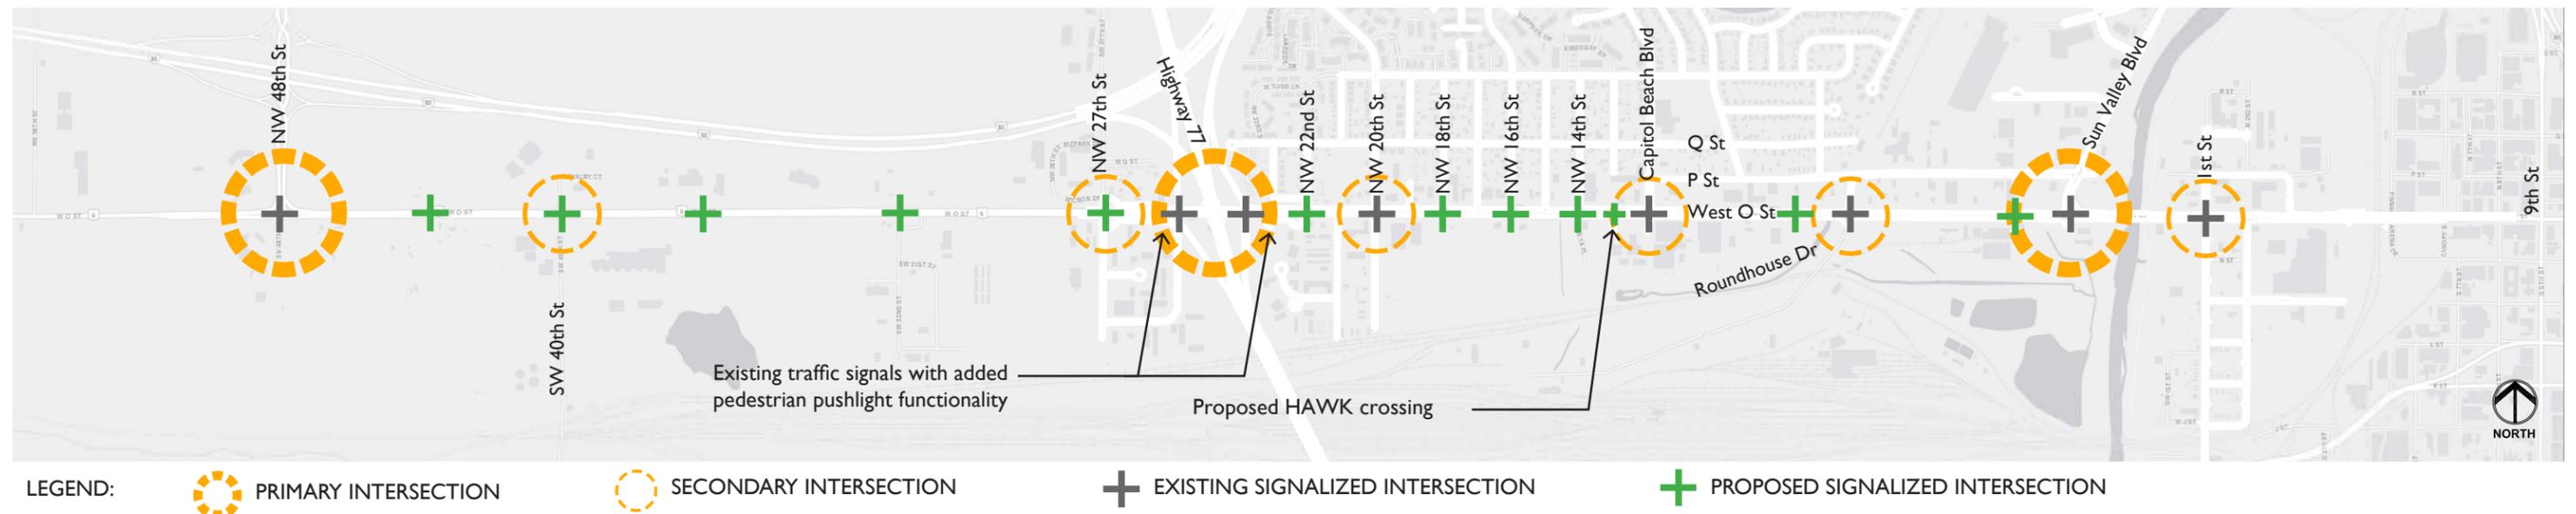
Proposed Intersections / Crossings Plan Diagram
